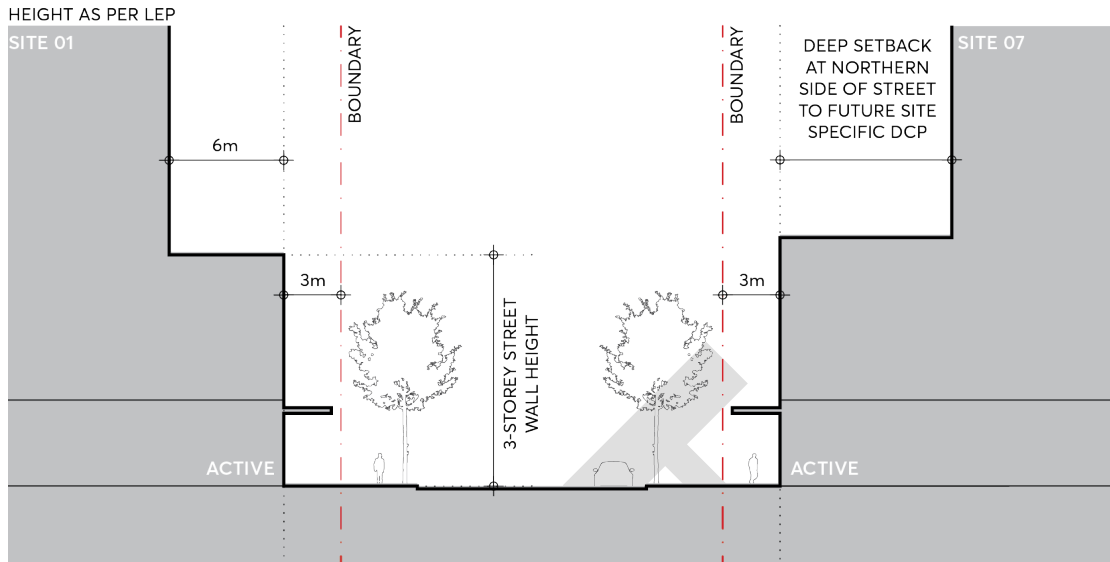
Marion Street (Section B) Setbacks and Street Wall Height
